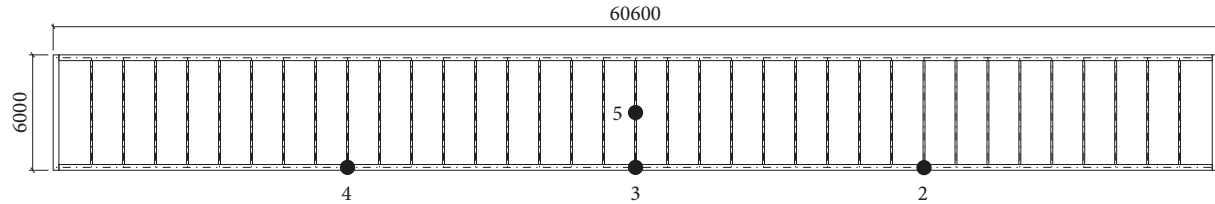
60 m aerial corridor structure vibration test point layout (top view).
